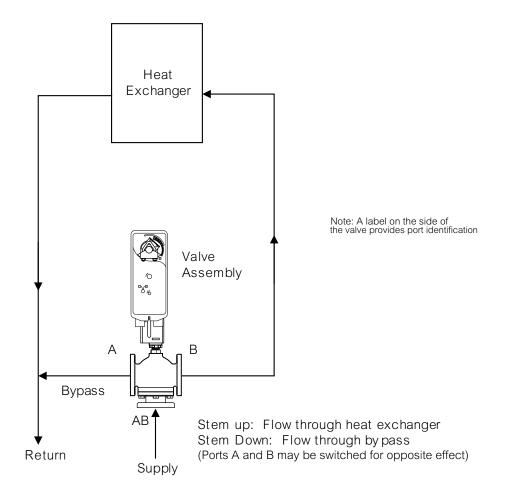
Typical Piping of VB-8303 as 3-Way Diverting Valve
